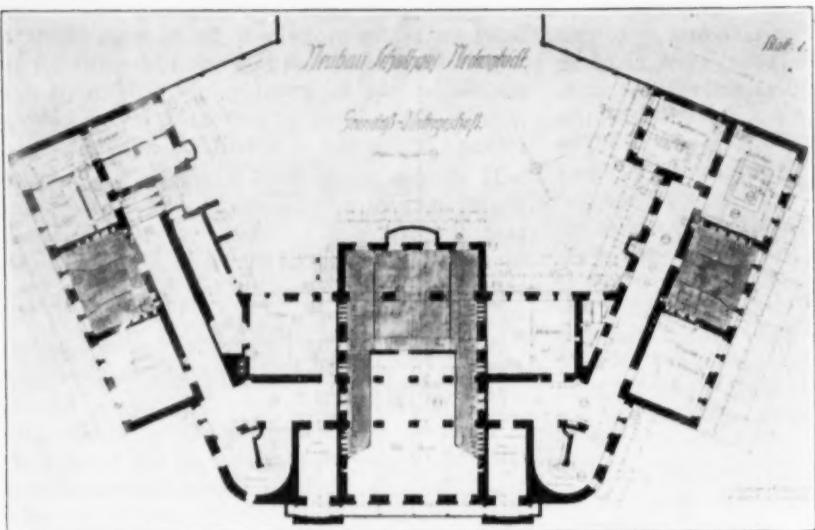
BASEMENT FLOOR PLAN OF A NEW SCHOOLHOUSE AT MANNHEIM, GERMANY. THE SHADED SPACES CONTAIN THE HEATING AND VENTILATING CHAMBERS AND THE ADJOINING PARTITION WALLS THE DUCTS.
